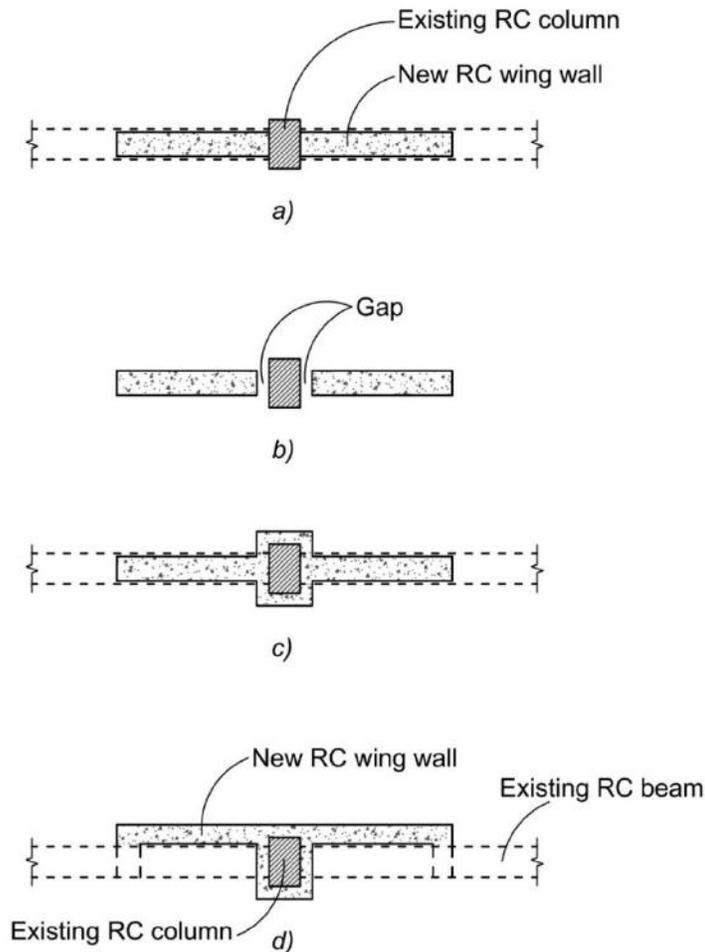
RC wing walls: a) wing walls integrated with an existing RC column; b) wing walls with a gap between the new wall and the existing RC column; c) interior wing walls enclosing an existing RC column, and d) exterior wing walls enclosing an existing RC column.
